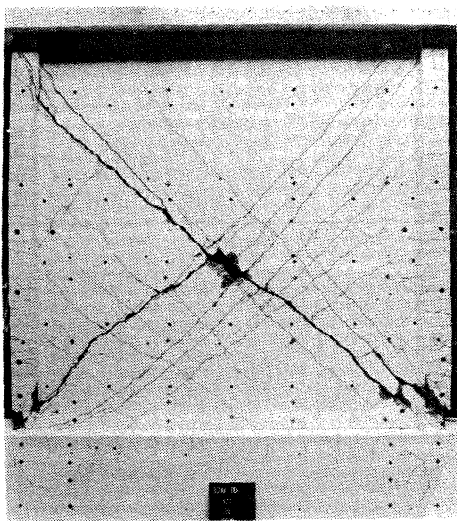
FAILURE OF A SQUAT WALL WITH LIMITED DUCTILITY
